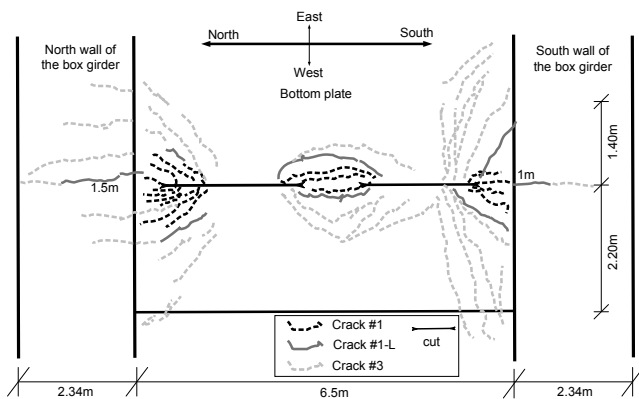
Schematic view of the crack appearance at the bottom plate for the cutting line at  $x=29.25$  m.
